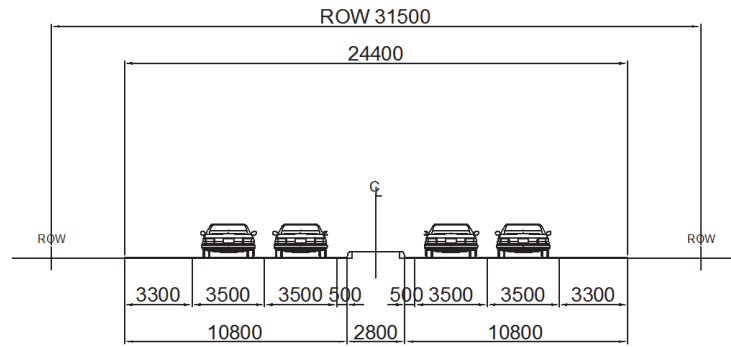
Basic Construction Step for Improvement of NH1 (At-grade Section)
